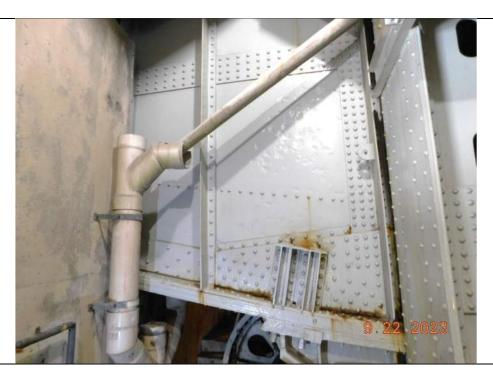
[Pier 5 Interior] -Girder 3W, East face between pier wall and trunnion tower, typical painted over section loss to web plate and minor corrosion along bottom flange, Looking West
